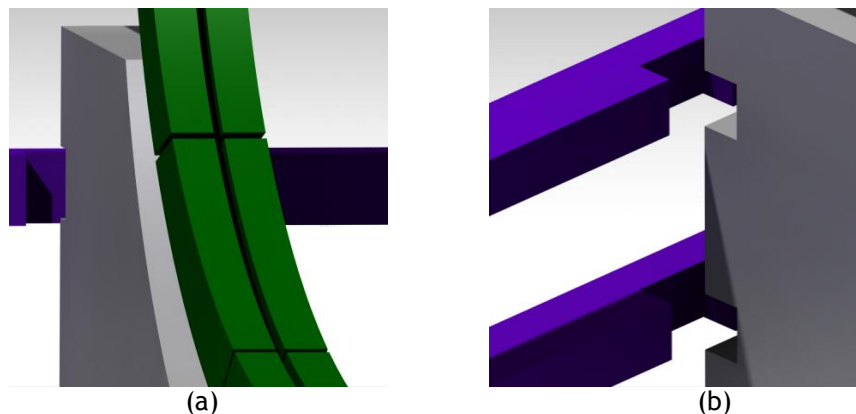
(a) Frames and girders attachment system; (b) Fitting system of support and longitudinal pieces
